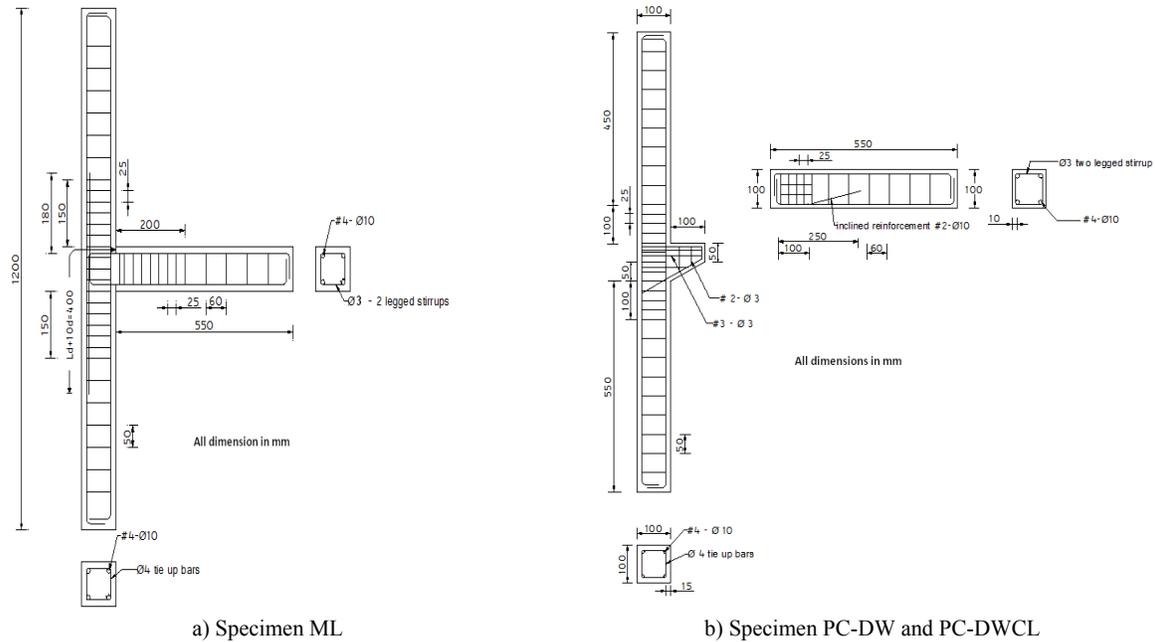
Reinforcement detailing of specimen PC-DW and PC-DWCL
